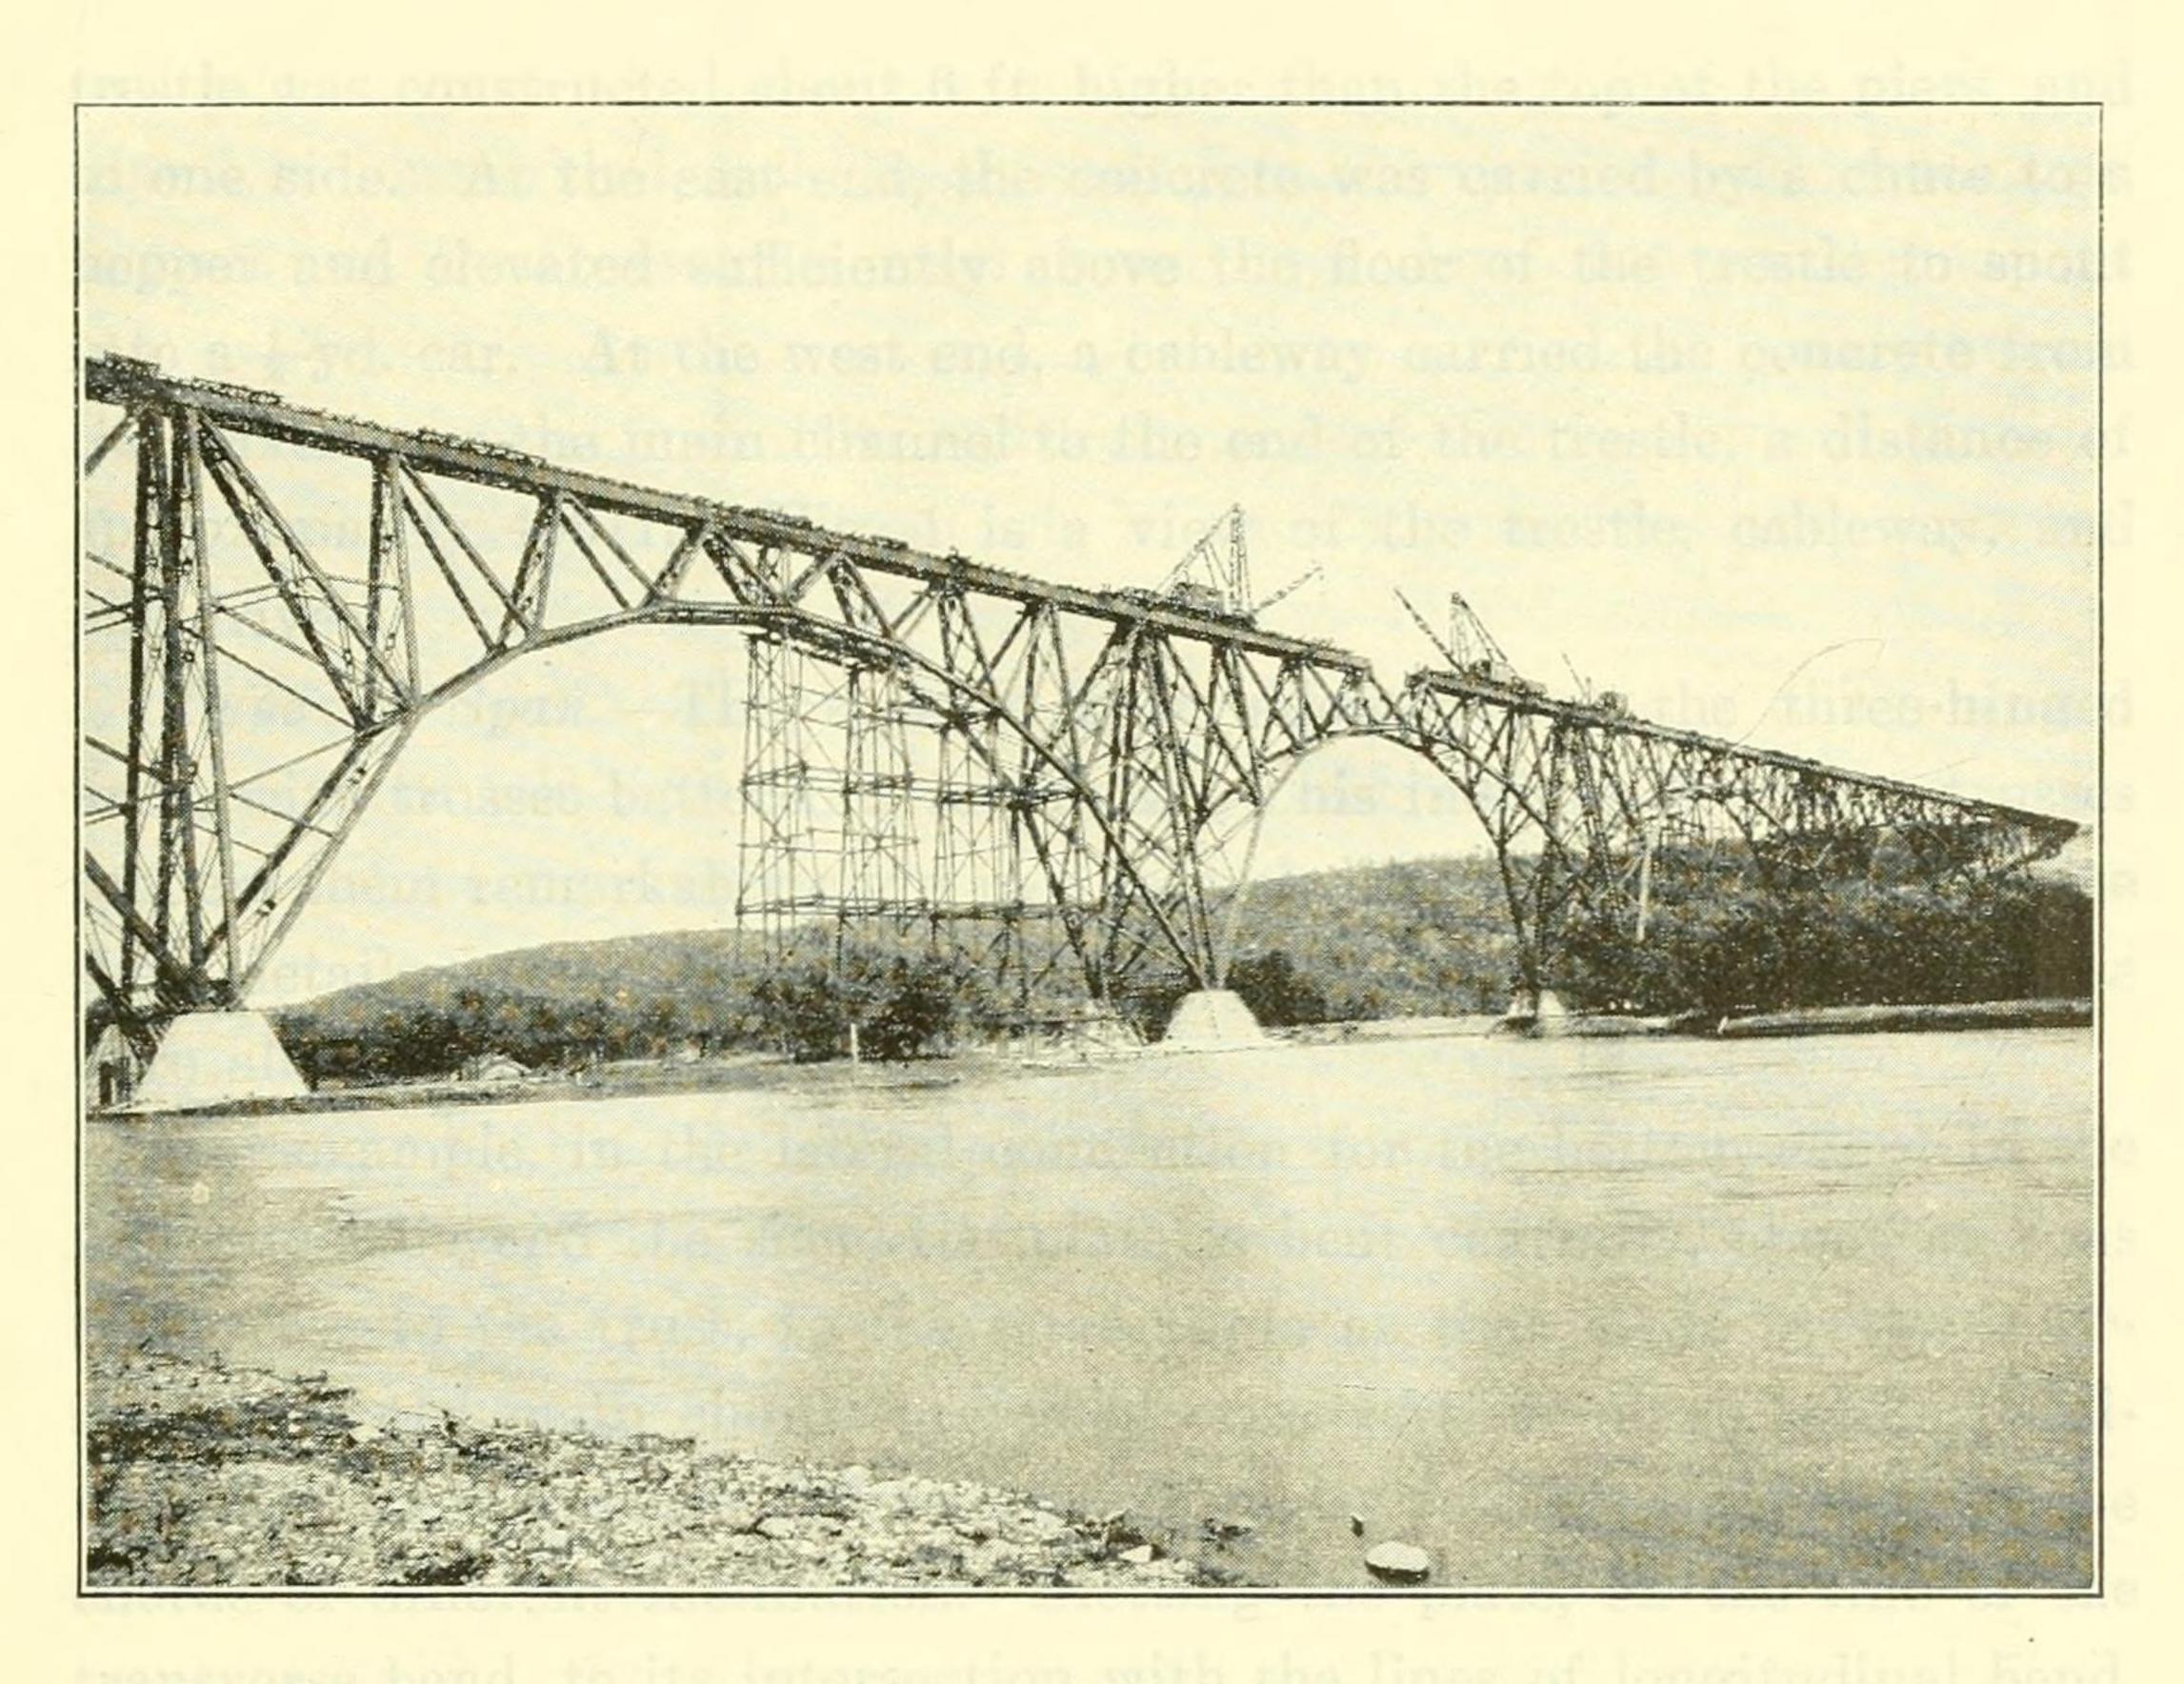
ERECTION OF CENTER ARCH WITHOUT FALSEWORK, AND THE HALF FALSEWORK USED FOR TWO ADJACENT SPANS.
